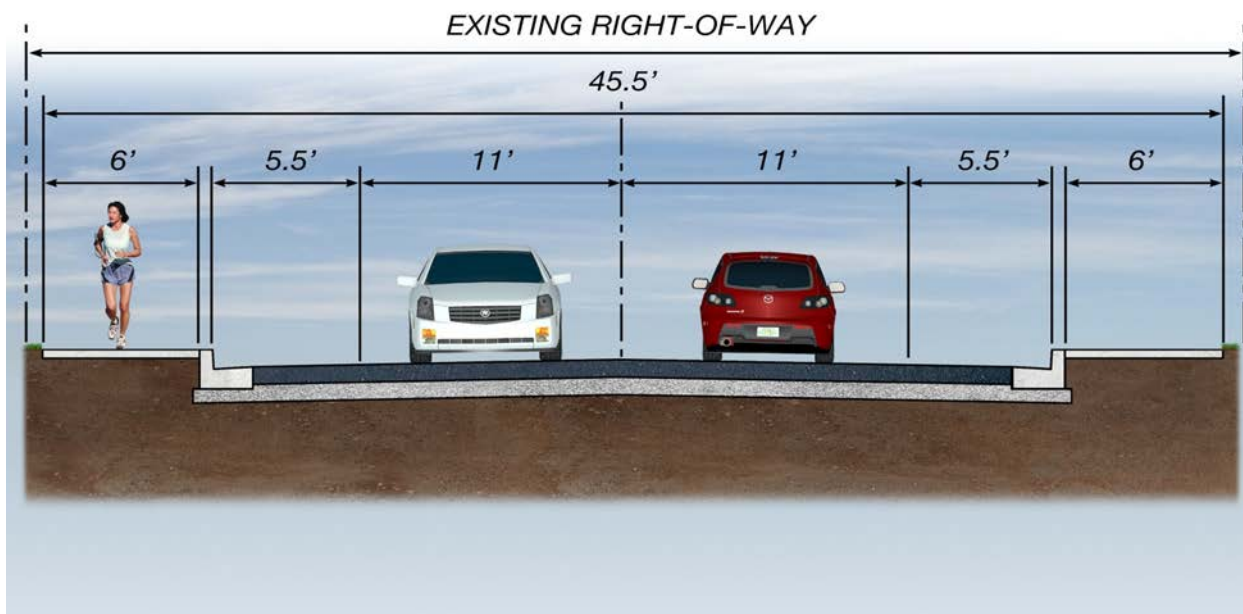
Proposed Roadway Section East of Proposed Movable Bridge
